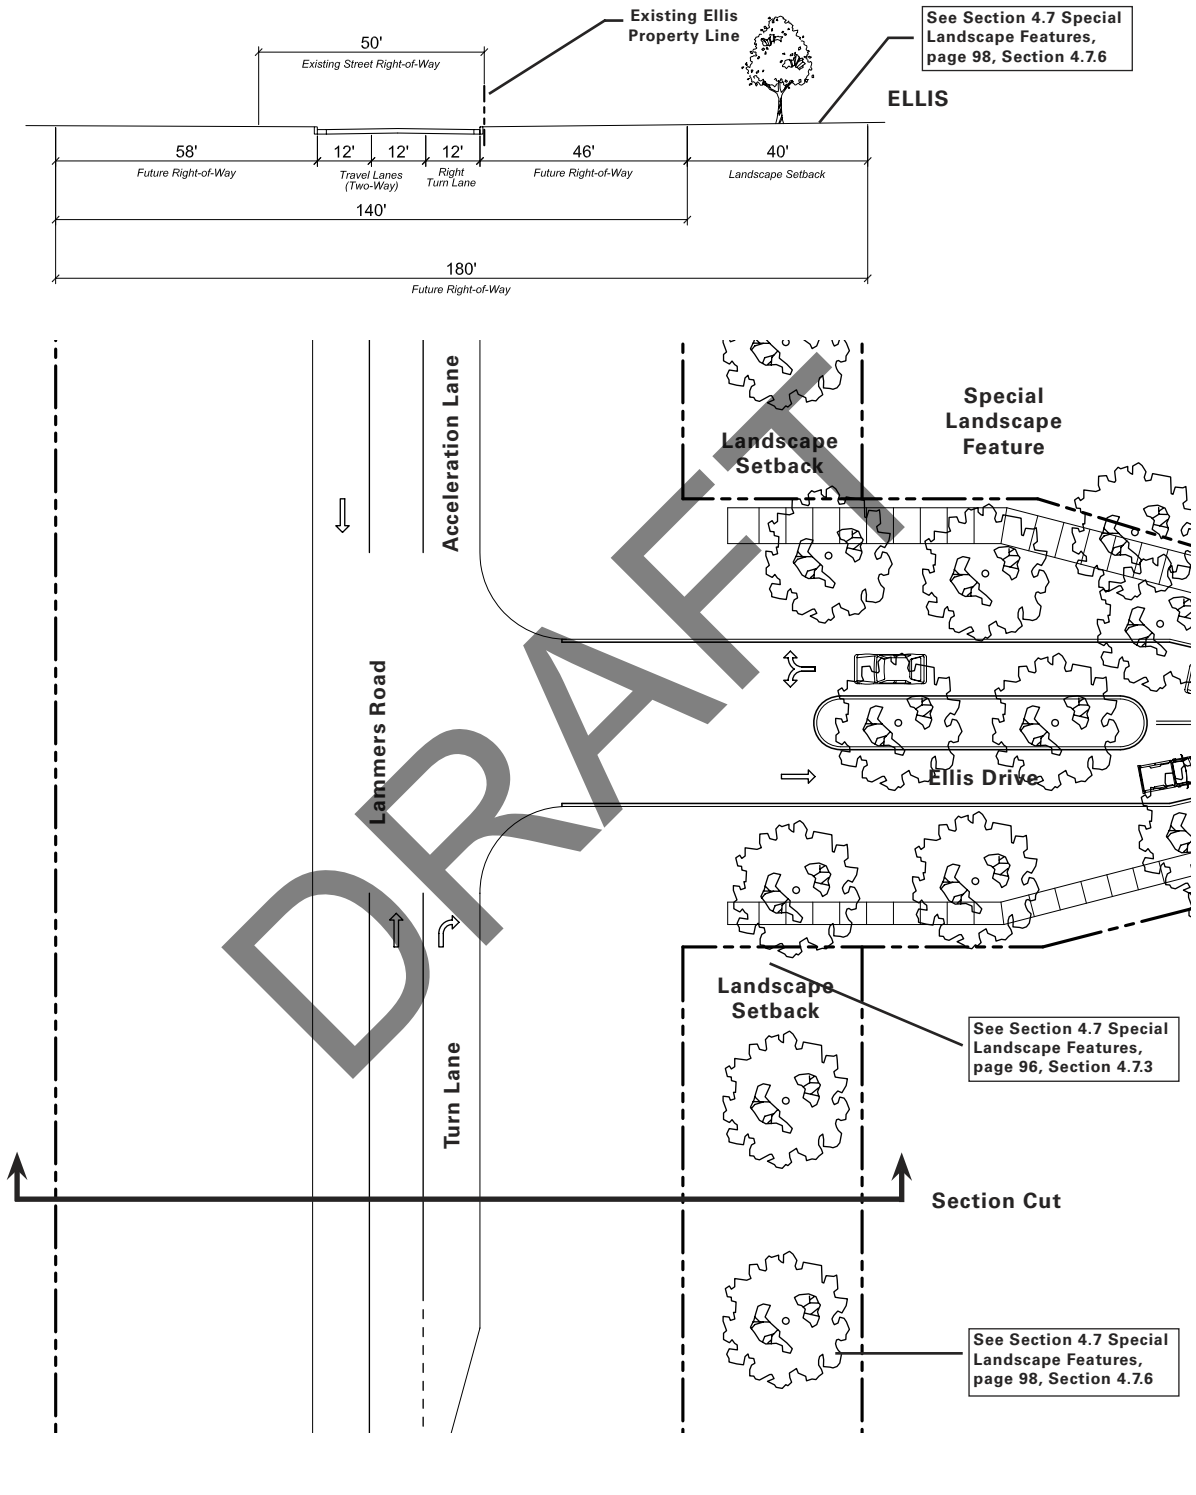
Existing Section and Plan: Regional Arterial – Lammers Road, Designation A (Cross-section at the time of connection of Ellis Drive to Lammers Road)
